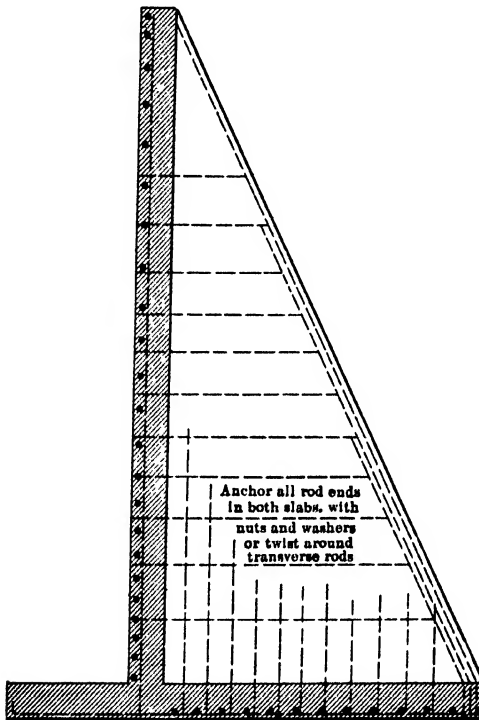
Reinforced-concrete retaining wall with buttresses.
